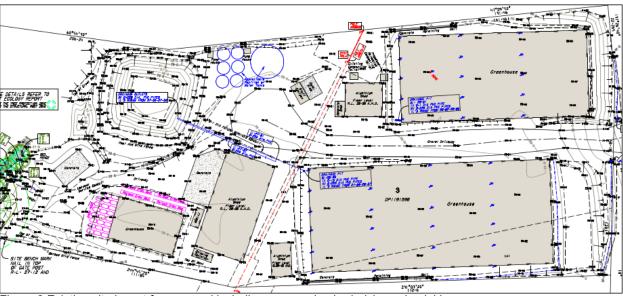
Existing site layout for approval including new garden beds (shown in pink)
